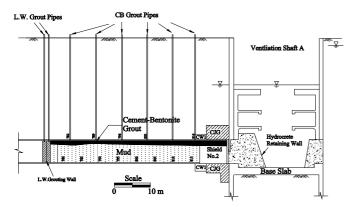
Damaged tunnel filled with cement-bentonite grout
